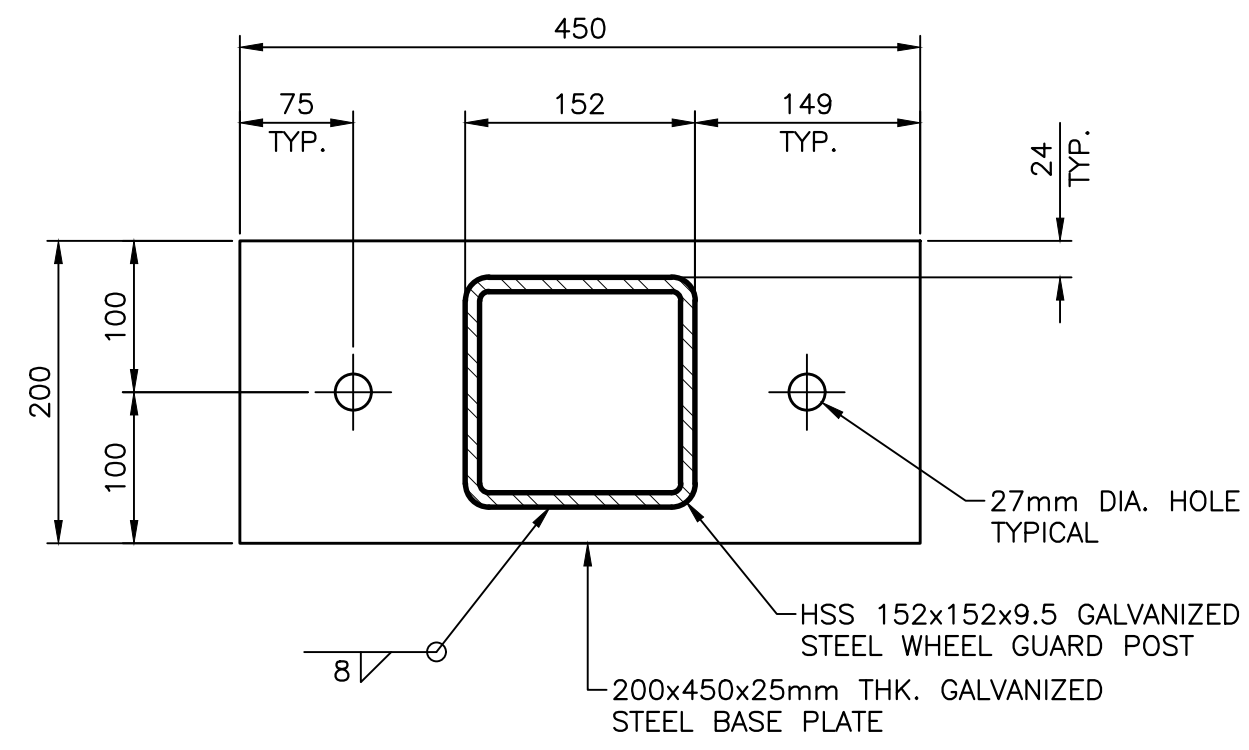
DETAIL OF STEEL CURB AND JOINT ASSEMBLY 20
